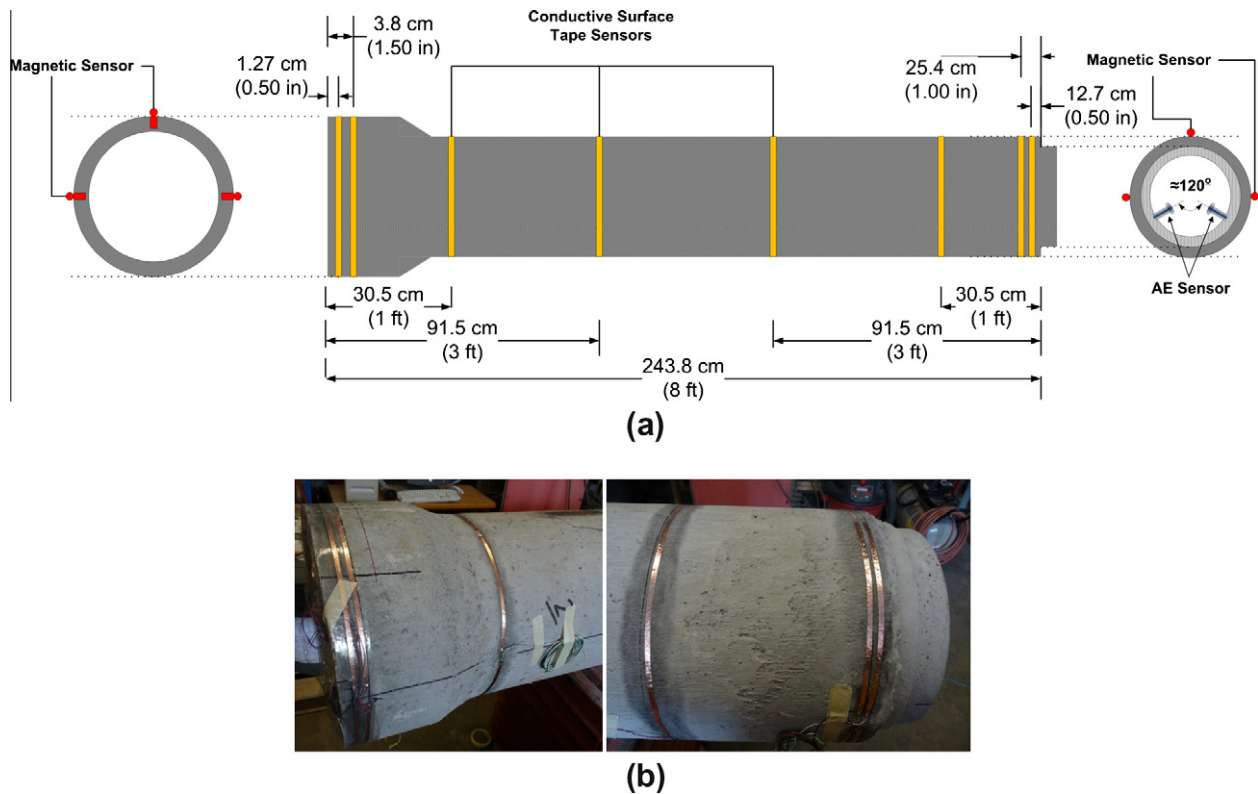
(a) Schematic illustration of instrumentation on a concrete pipe segment, (b) conductive surface tape sensors installed on the bell and on the spigot section of a concrete pipe segment.
